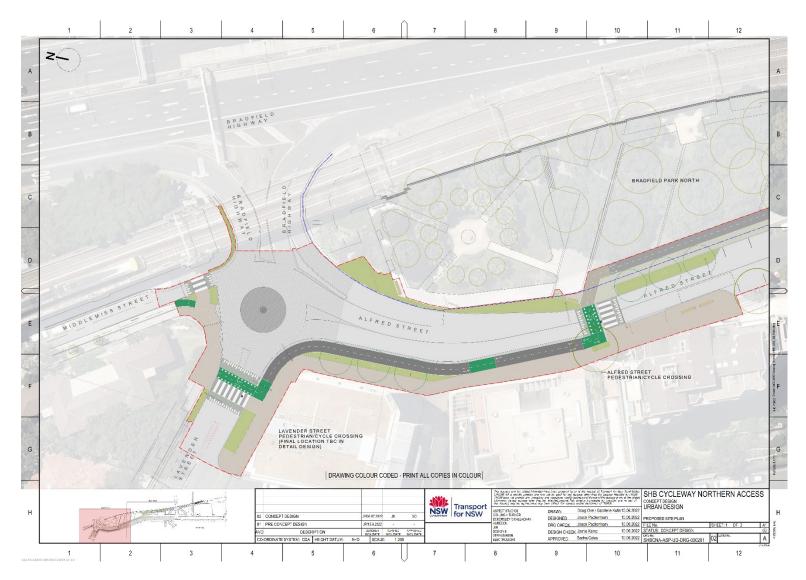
General Arrangement Plan: intersection of Alfred Street, Middlemiss Street and Lavender Street. Source: Urban Design drawings, Aspect, 2022)
